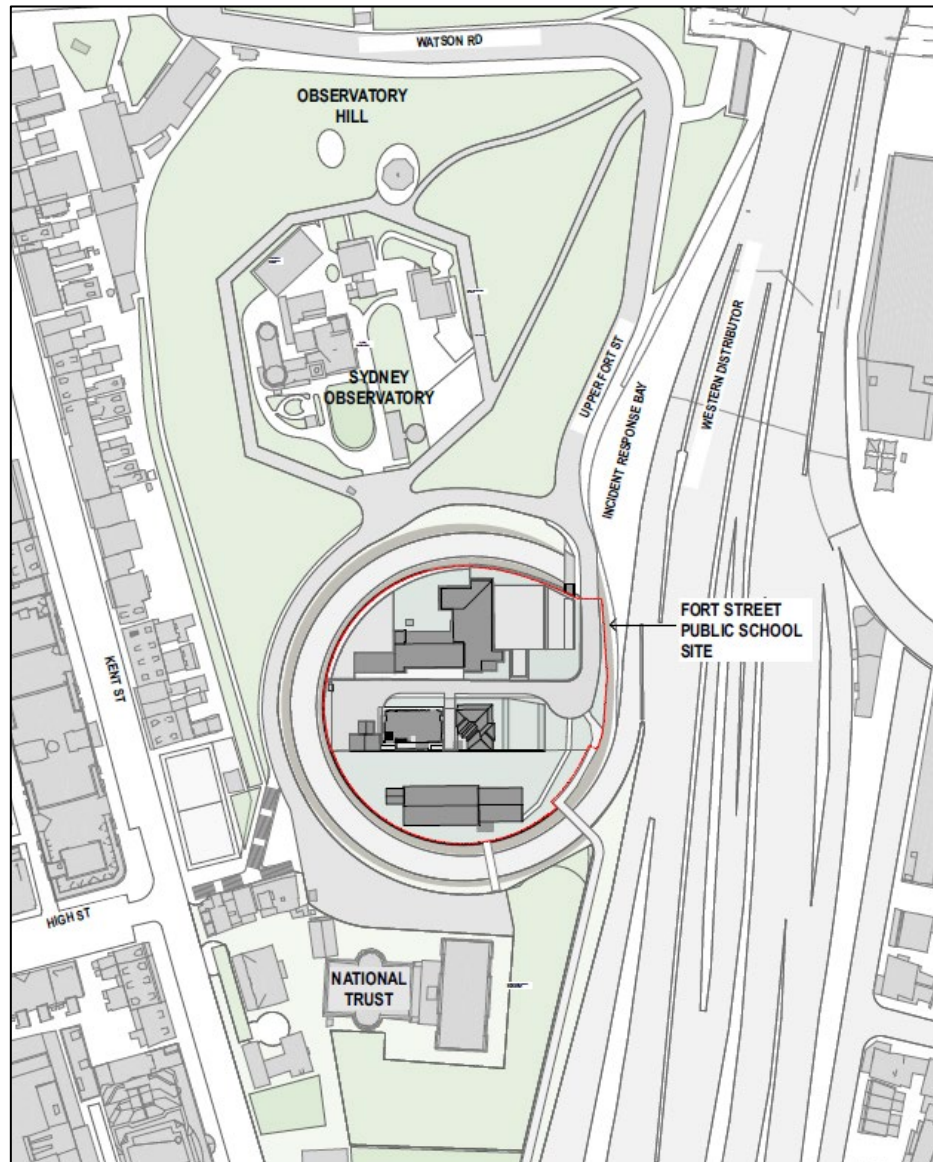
FSPS Location Plan indicating surrounding features (Source: FJMT Studio)
